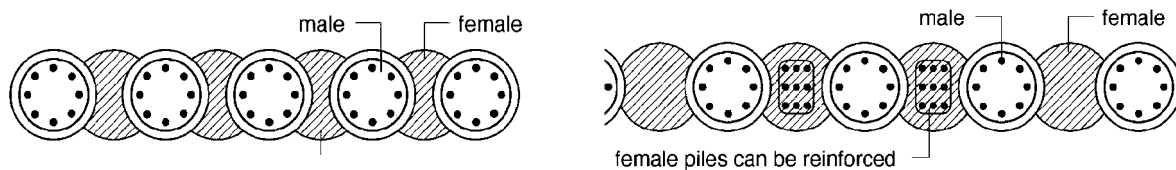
Typical secant pile wall arrangement with "female" (primary) and "male" (secondary) piles forming hard/soft walls (left) and hard/hard walls (right) after Suckling et al. (2005)
